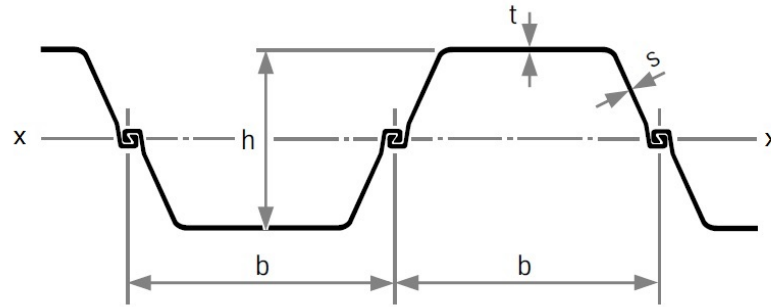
Steel sheet pile wall Larssen 603 – dimension labeling in cross section. Source: [29]
